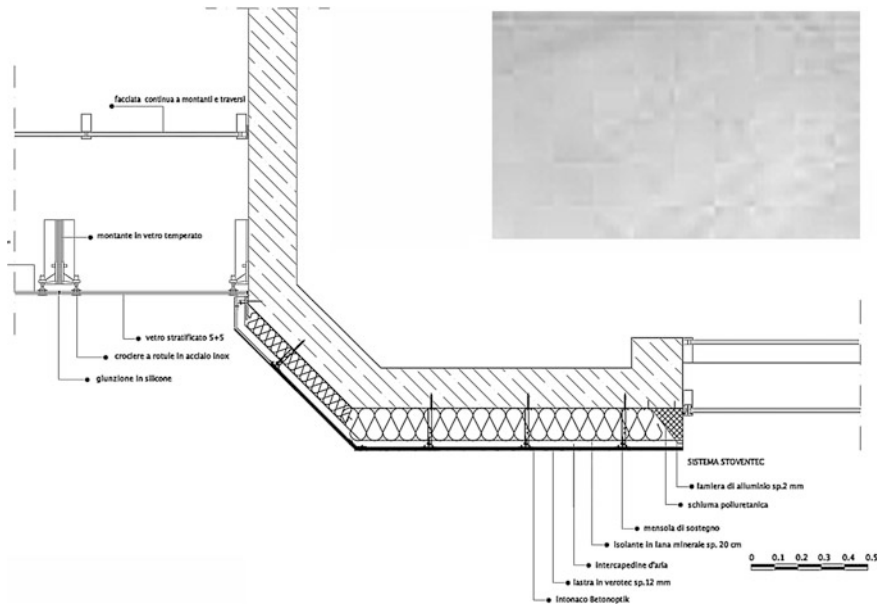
Recovery project: double skin façade; Betonoptik finish
